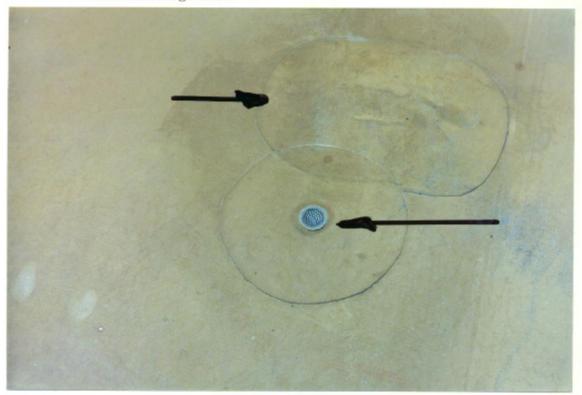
Photo Illustrating Typical Slope Vent Detail as well as Typical Original Field Patch. Note Flat Condition and Tight Bond to Surface.
